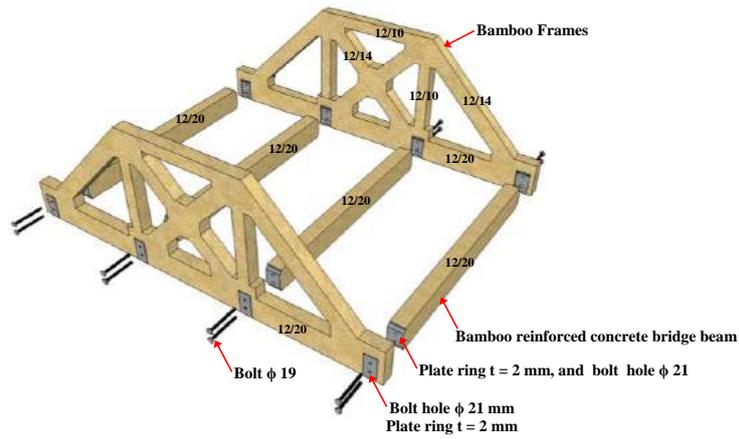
Model of the precast bridge from bamboo reinforced concrete
